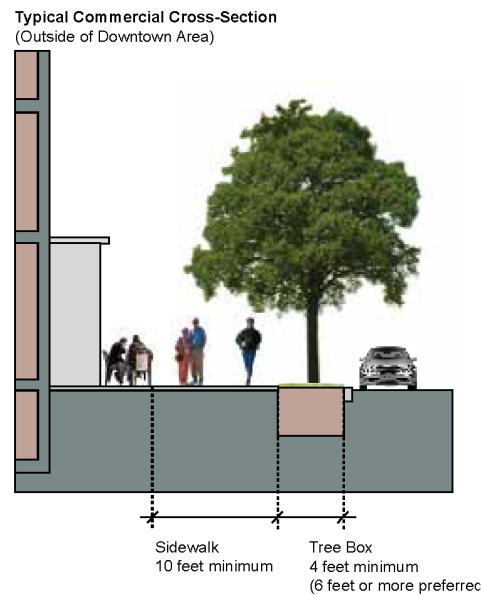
"Typical Commercial Cross-Section (Outside of Downtown Area)" displays spatial relationship between sidewalk and tree planting area for DC. (DDOT, 2019b, p. 3-3)
